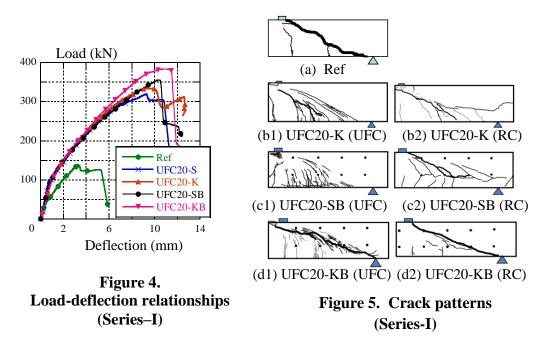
shows the relationship between load and the mid-span deflection. Figure 5 shows the crack patterns observed after the loading tests. For specimens with UFC formwork, the crack patterns of both UFC and inside RC part are shown. After the loading test, UFC formworks were removed and the diagonal crack of inside RC part was observed. The bold lines in Fig. 4 represent the critical cracks.
